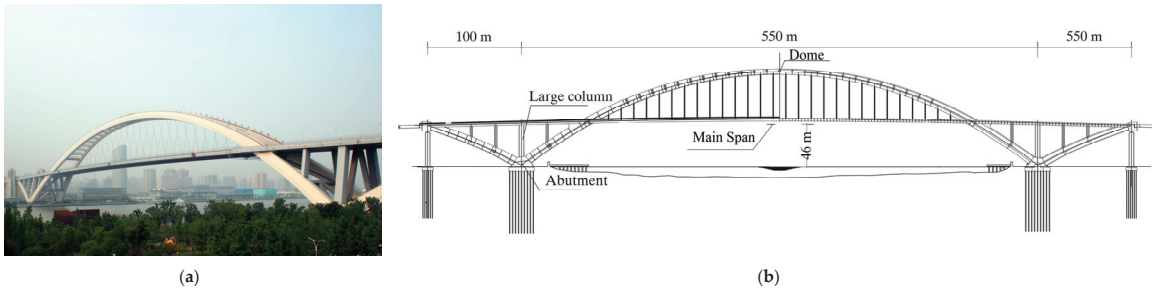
(a) The Lupu Bridge; (b) side view and main dimensions.
